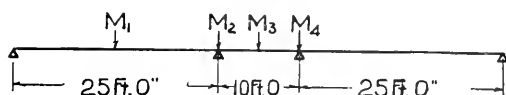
TYPICAL ARRANGEMENT OF BEAM SPANS.
